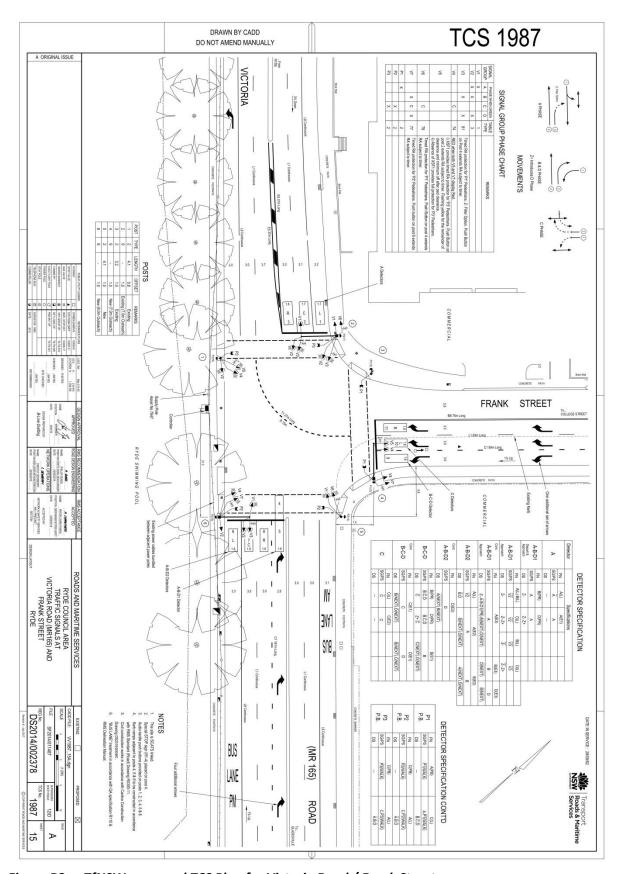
TfNSW approved TCS Plan for Victoria Road / Frank Street
